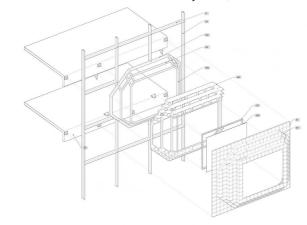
Figure showing construction detail of windows of the facade (UUfie, 2015)
